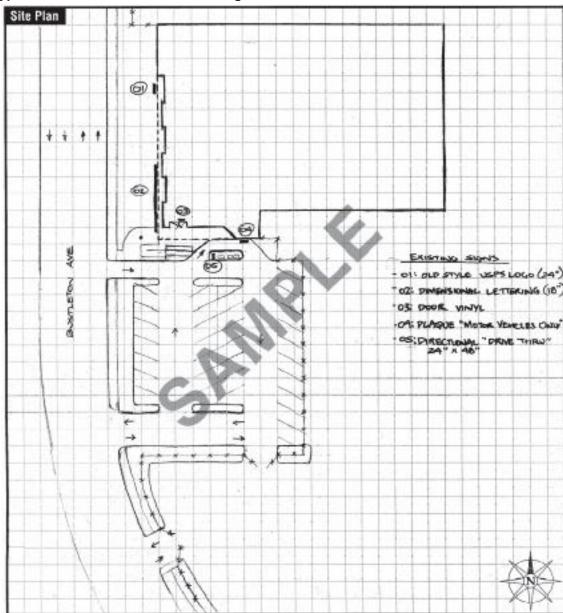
Typical Exterior Plan View-Freestanding Post Office
